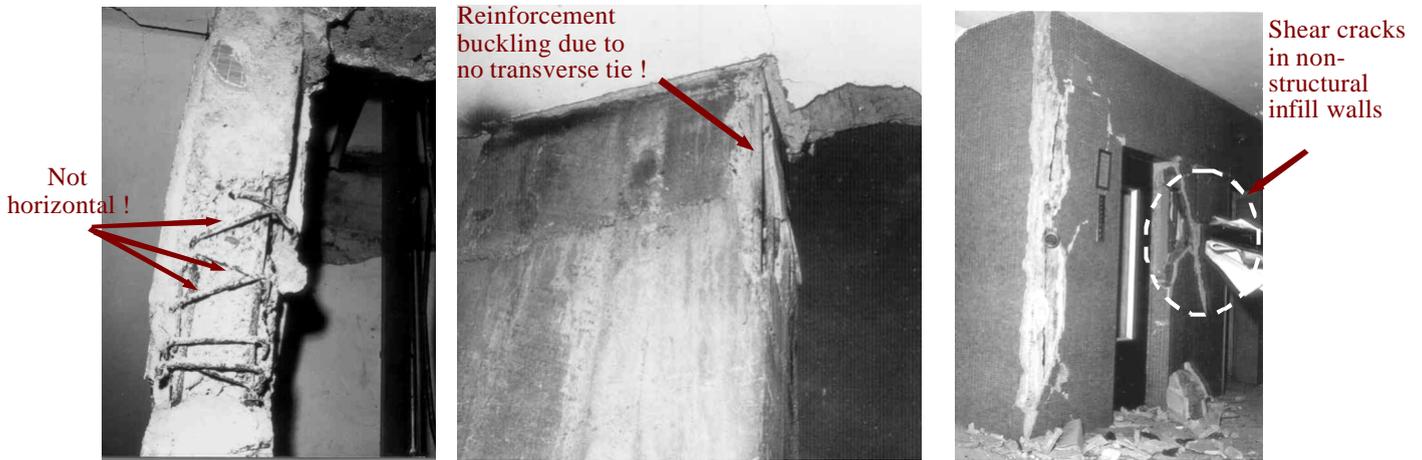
Typical examples to structural and non-structural heavy damage in the building after July 22, 1967 earthquake [4]
